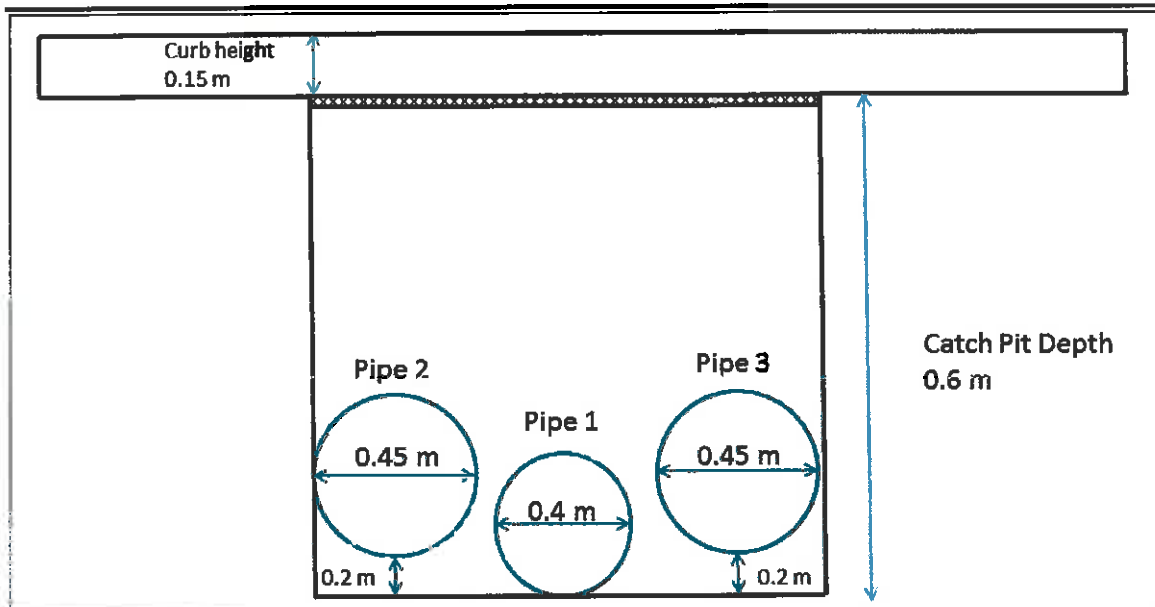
Conceptual Cross Section Schematic of the Catch Pit and the Stormwater diversion Pipes.
